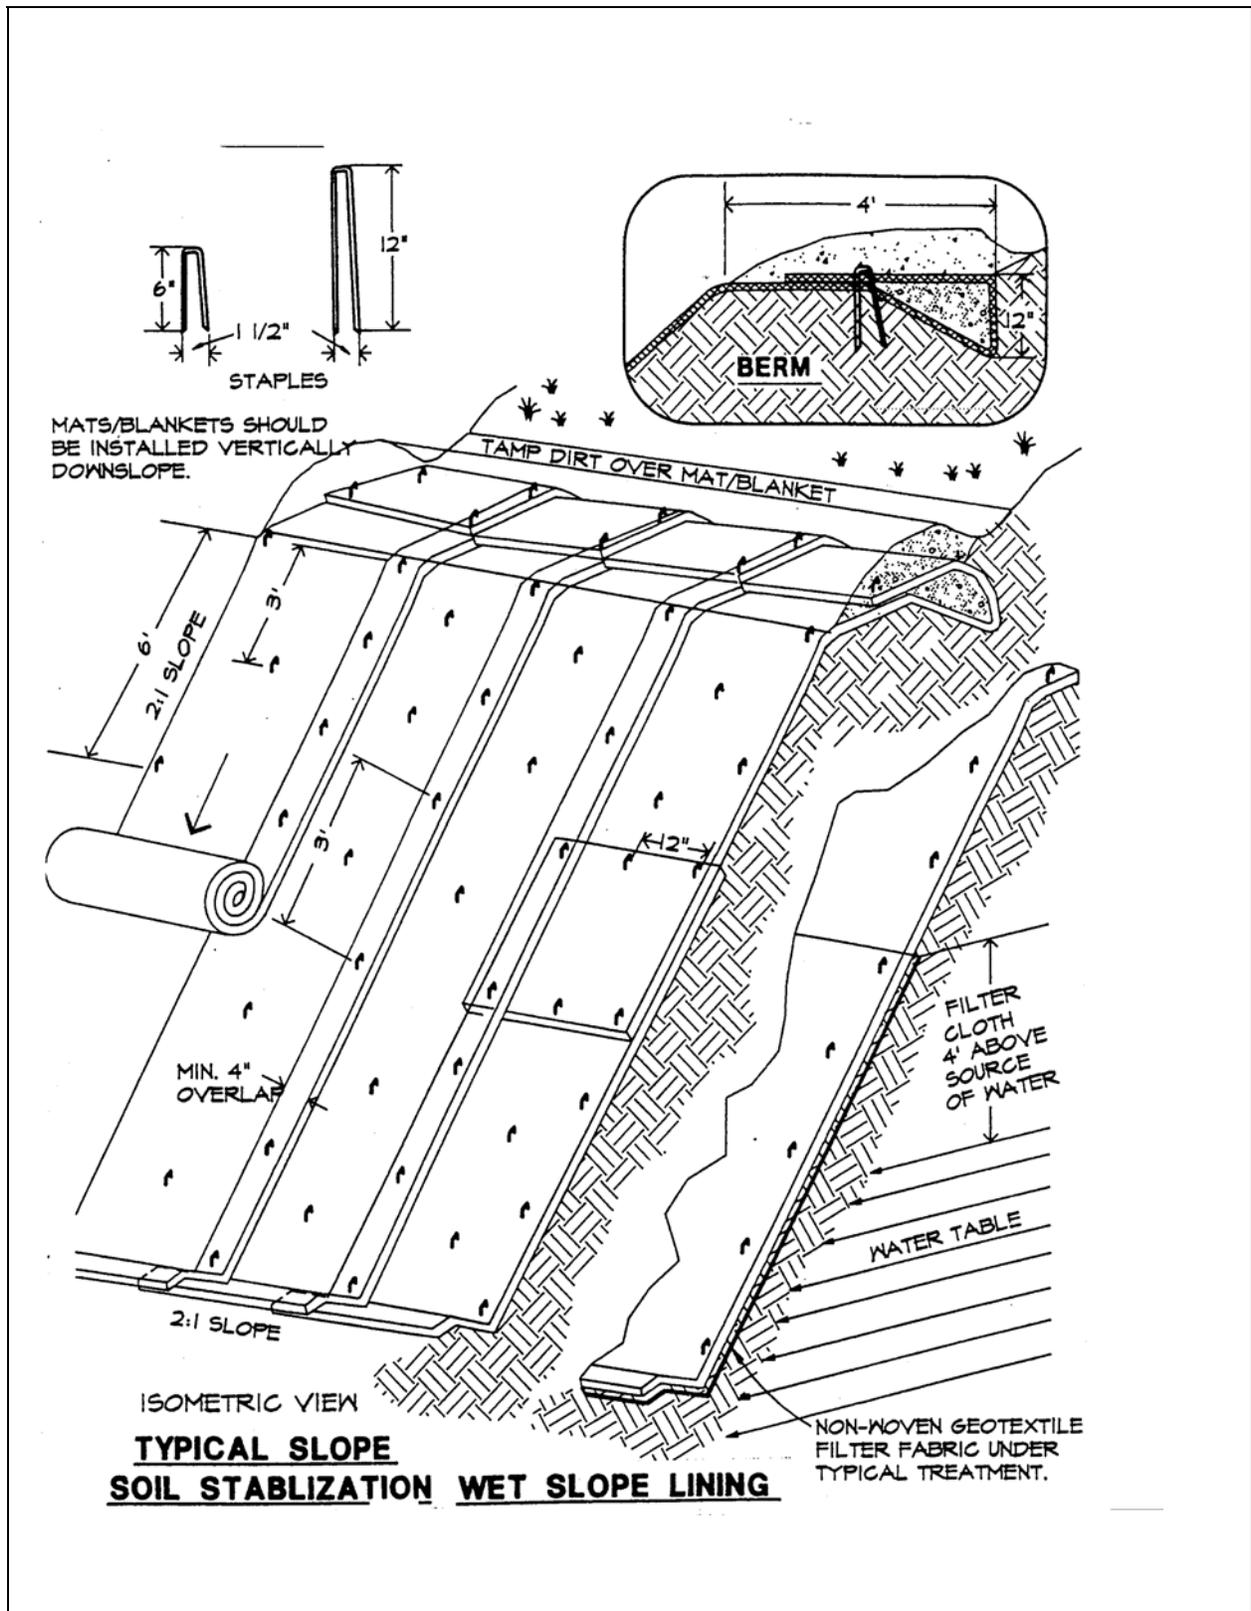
Erosion Blankets and Turf Reinforcement Mats - Slope Installation
